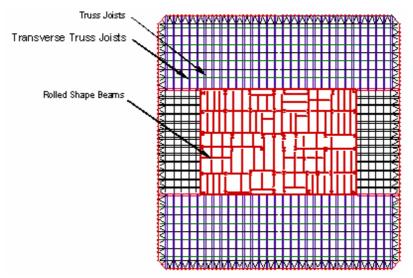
Typical floor framing plan of the World Trade Center for floors above 10th floor
